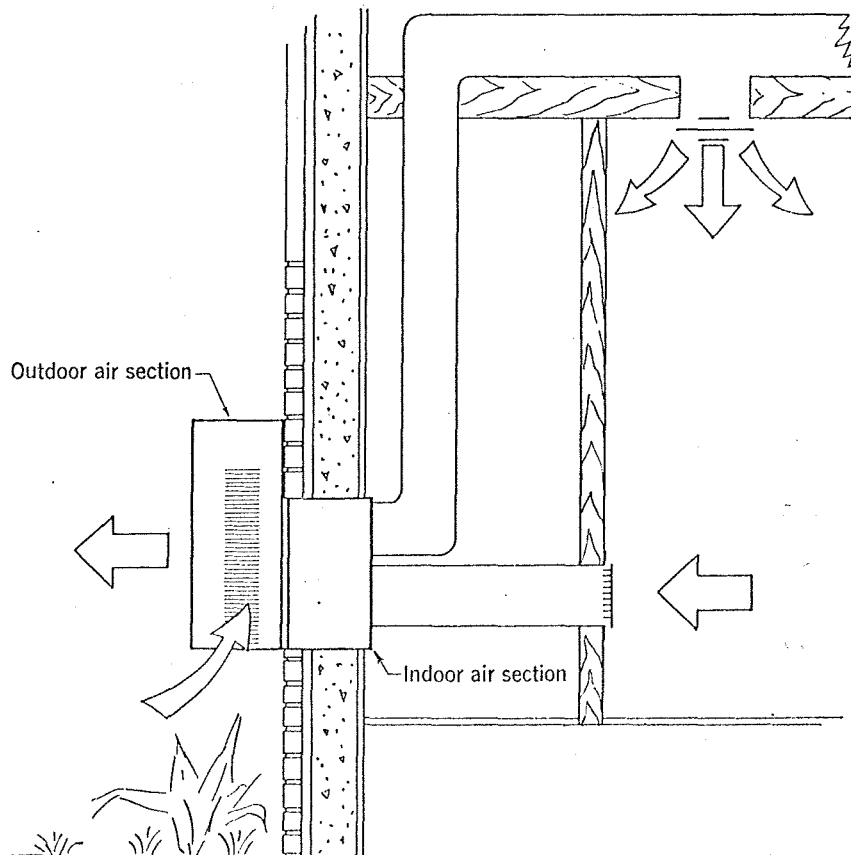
Horizontal, single package unit mounted thru the wall.
